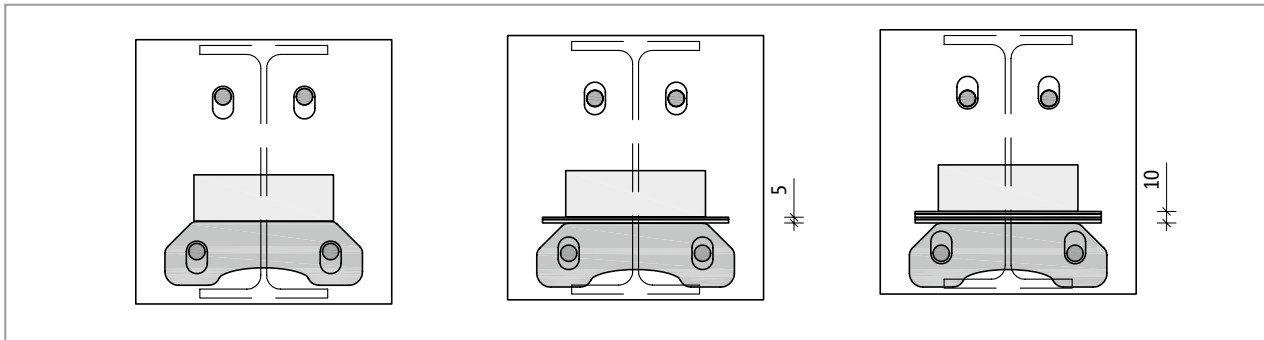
Schöck Isokorb® T type SK: Adding design shims (5 mm high) on the load plate will raise the fixing plate and bring the centre of the vertical slots in line with the axes of the thread bolts on the T type SK; using this as a starting level will allow vertical tolerance of  $\pm 5$  mm
